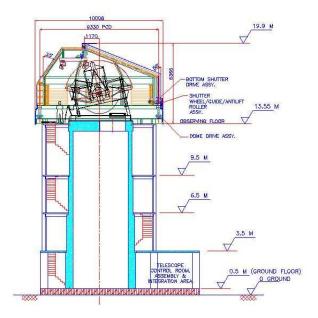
Schematic section of telescope enclosure and dome. The telescope is shown mounted atop the hallow pier. The telescope mirror can be lowered down through the pier for aluminising
